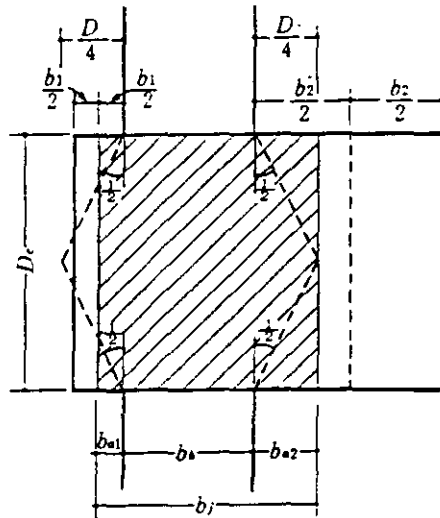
Defined effective width of beam-column joint, which is used in case of eccentric joint and/or different widths between beam and column.
